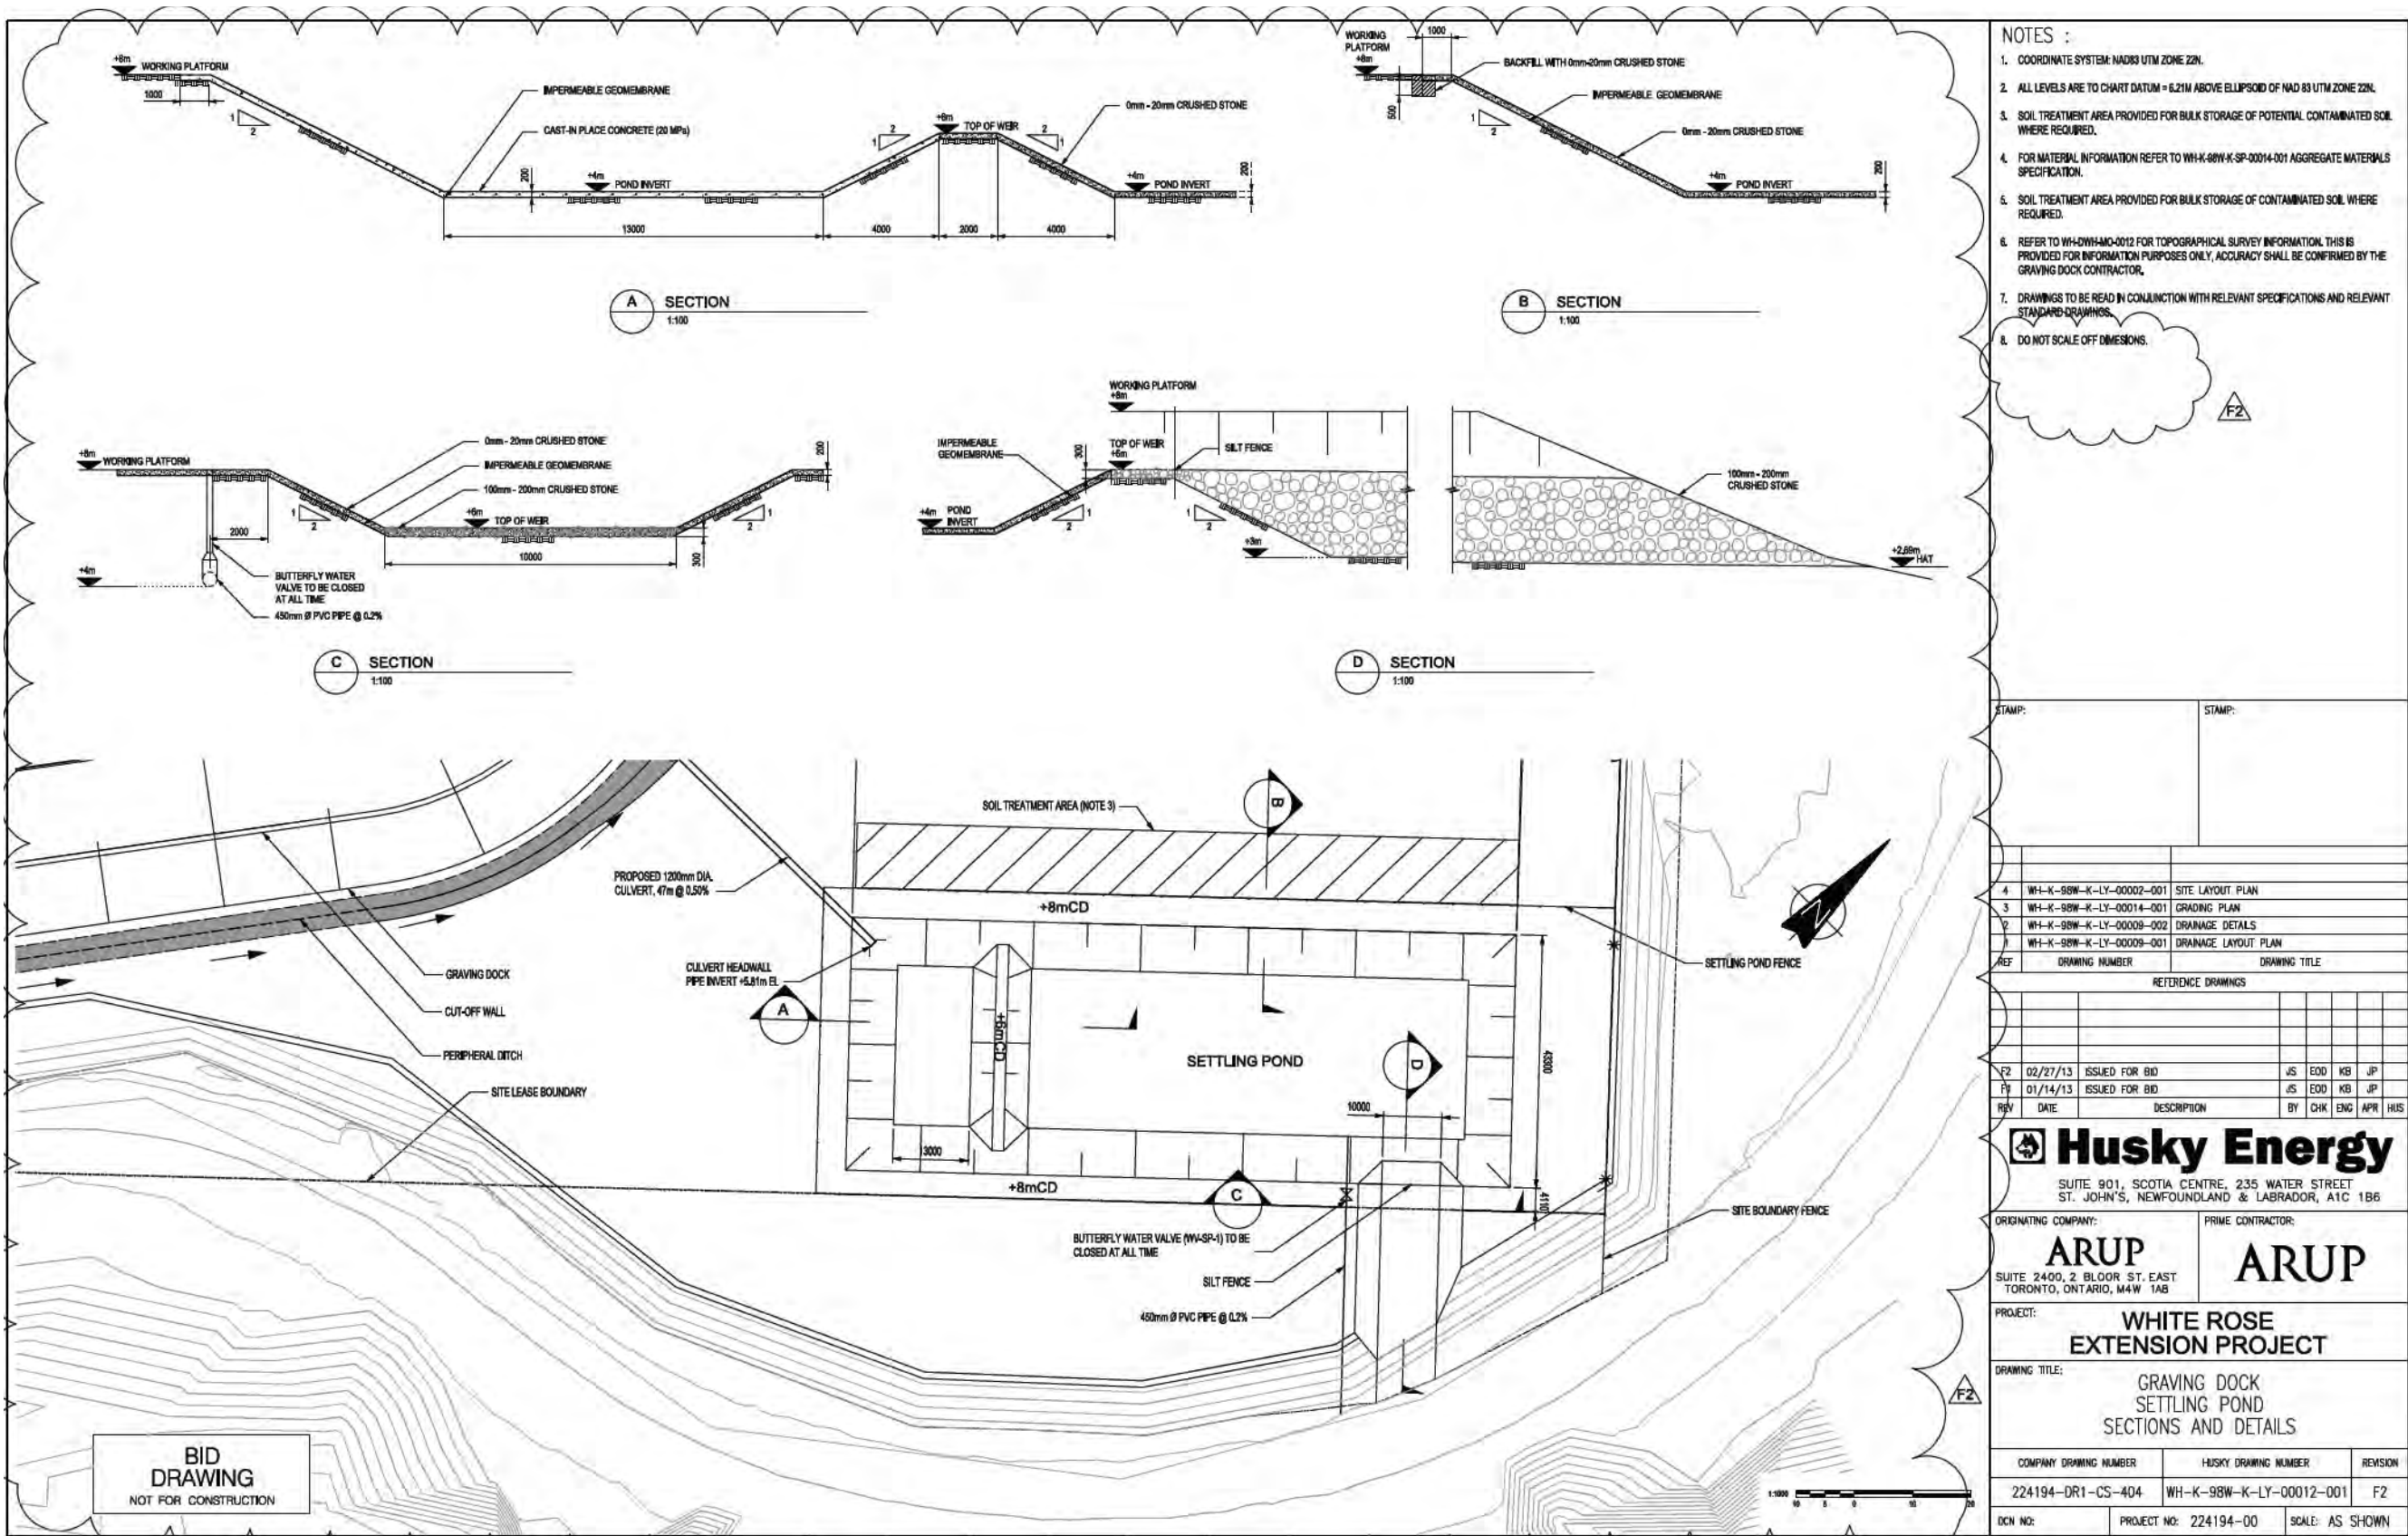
Draft Settling Pond Plan (Drawing # WH-K-98W-K-LY-00012-001)
